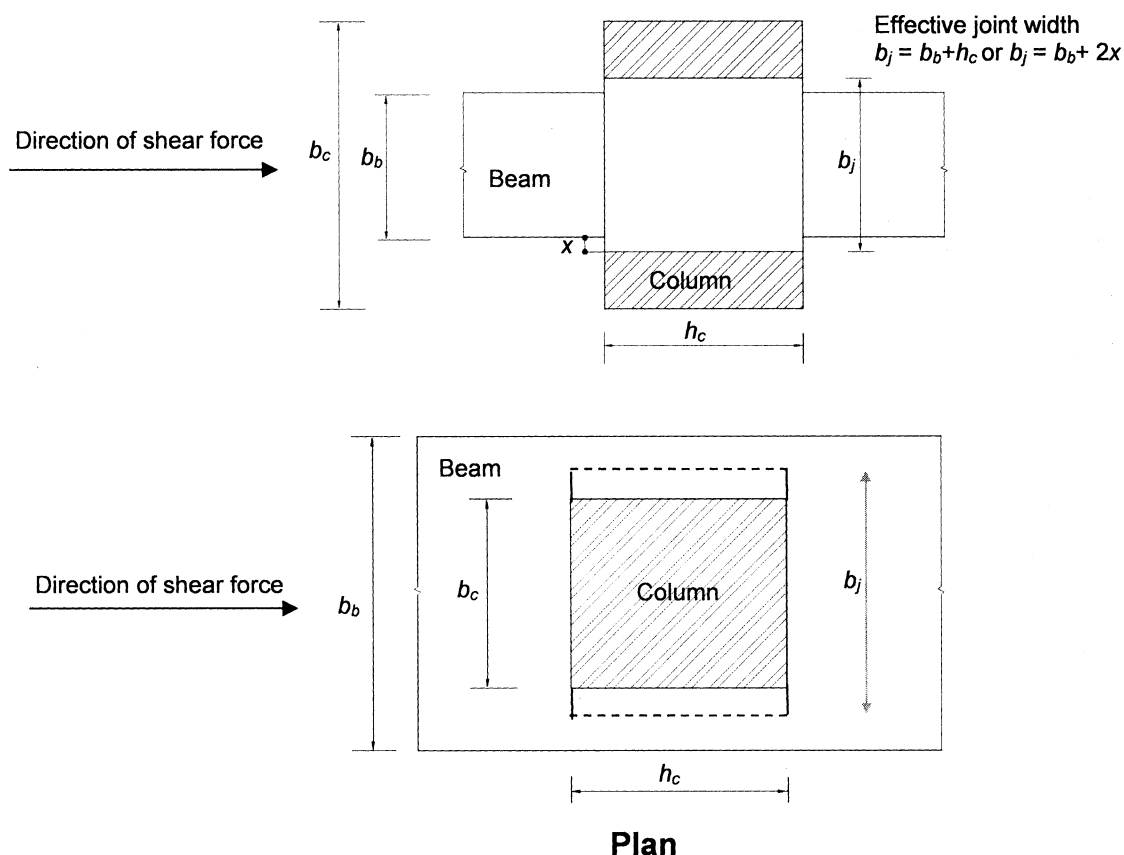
PLAN VIEW OF A BEAM COLUMN JOINT SHOWING EFFECTIVE BREADTH AND WIDTH OF JOINT
